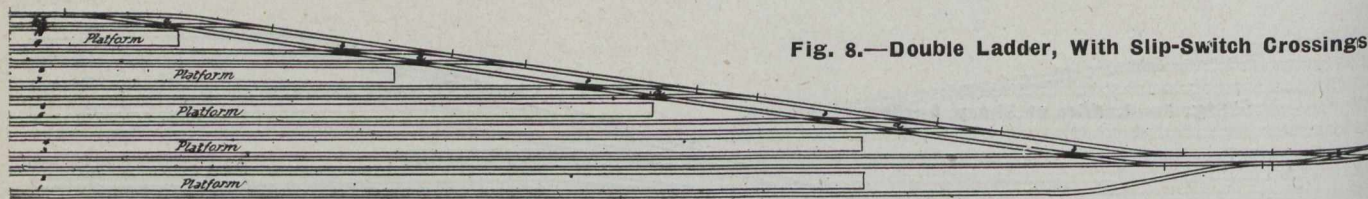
Double Ladder, With Slip-Switch Crossings.
